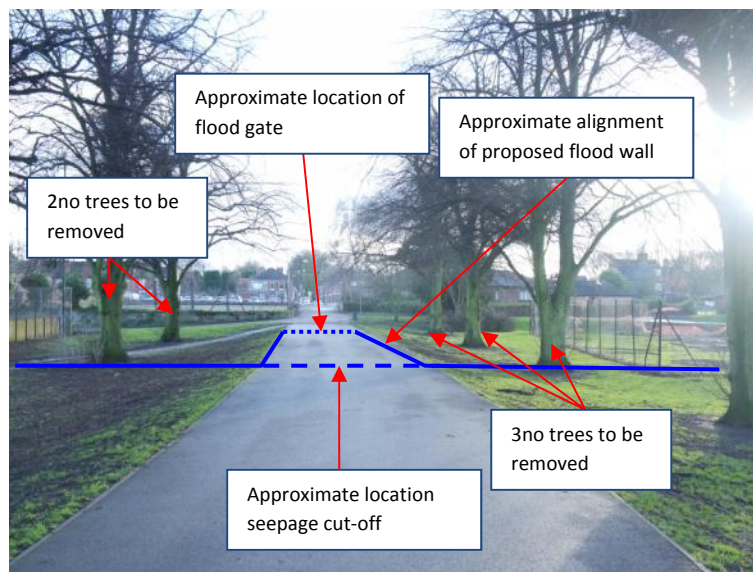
Proposed layout of flood wall across public footpath and cycle path
